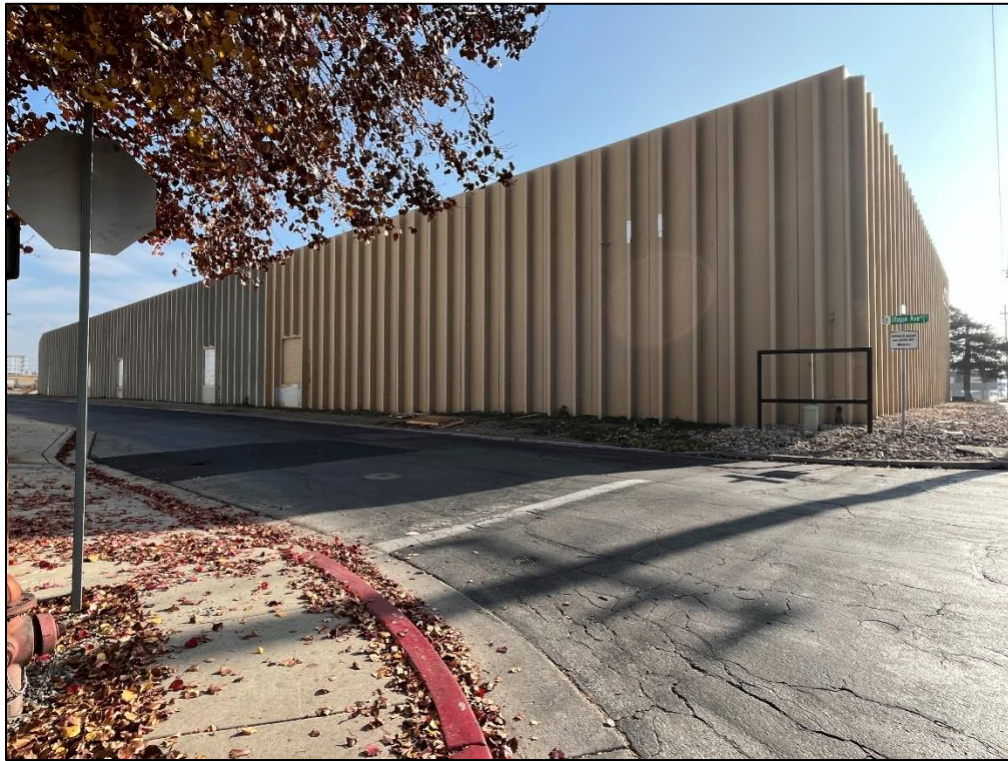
View of building at 2191 South 300 West from northwestern corner of parcel, facing southeast.
